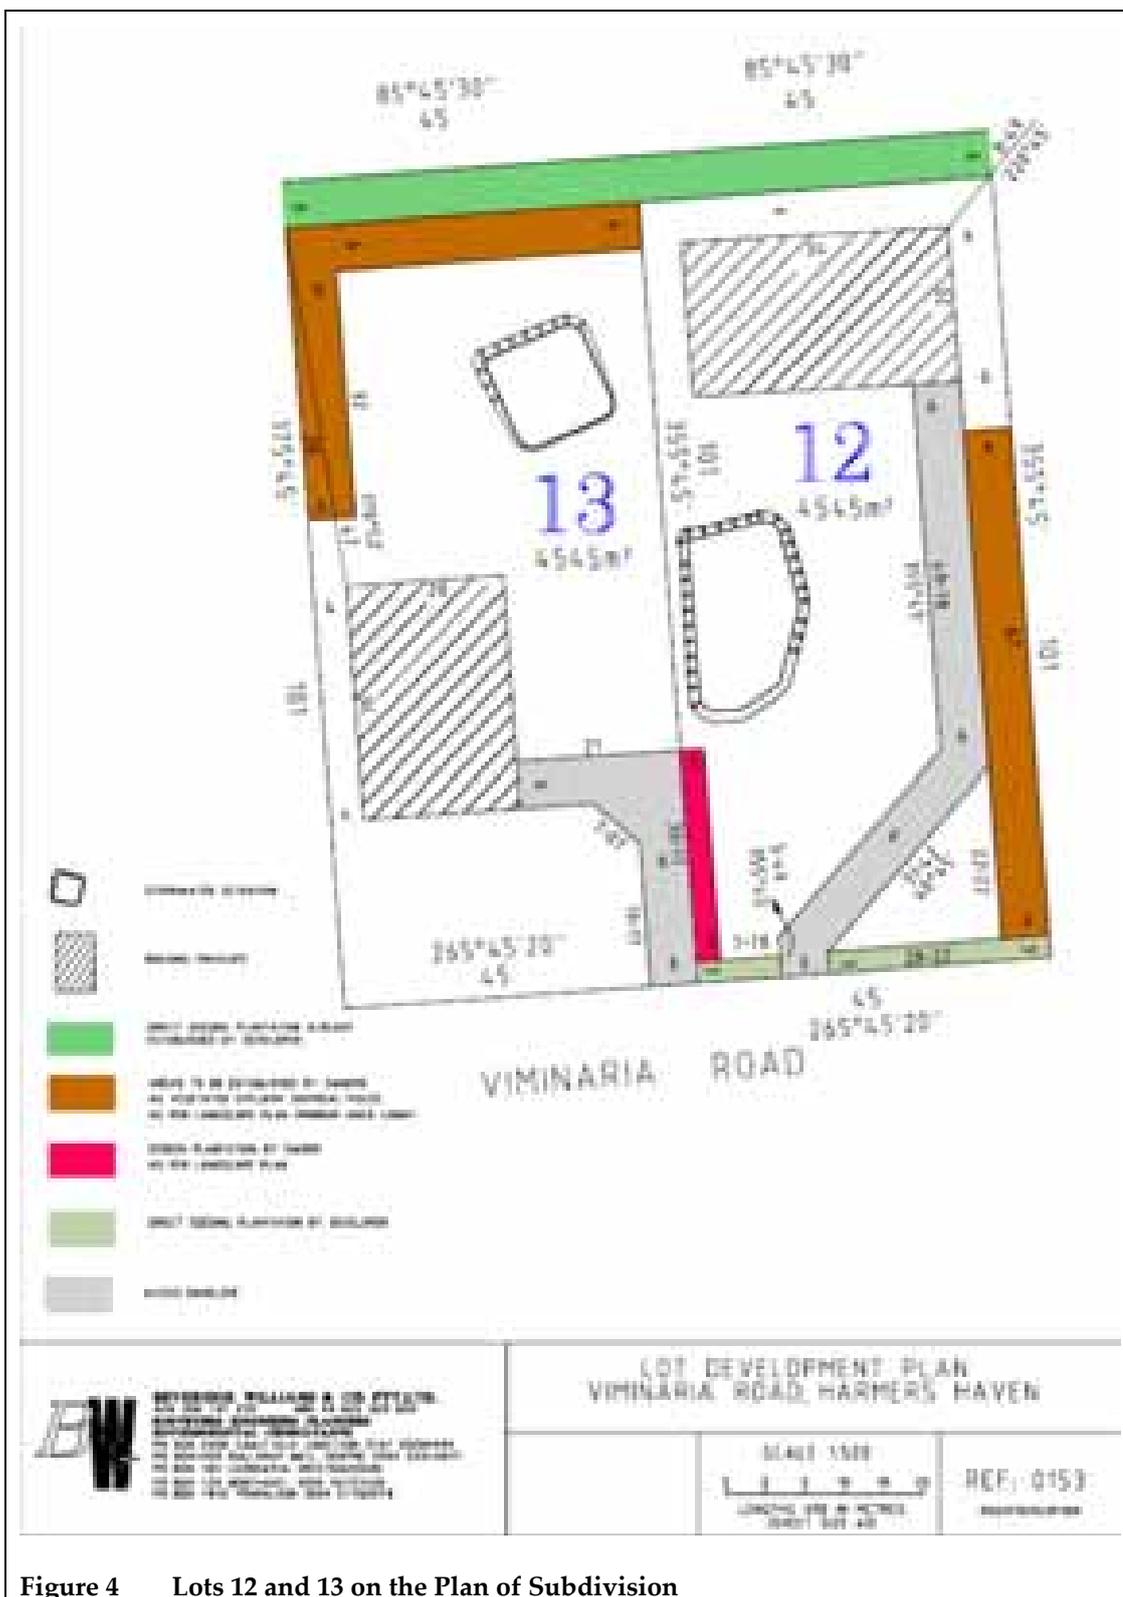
Lots 12 and 13 on the Plan of Subdivision
